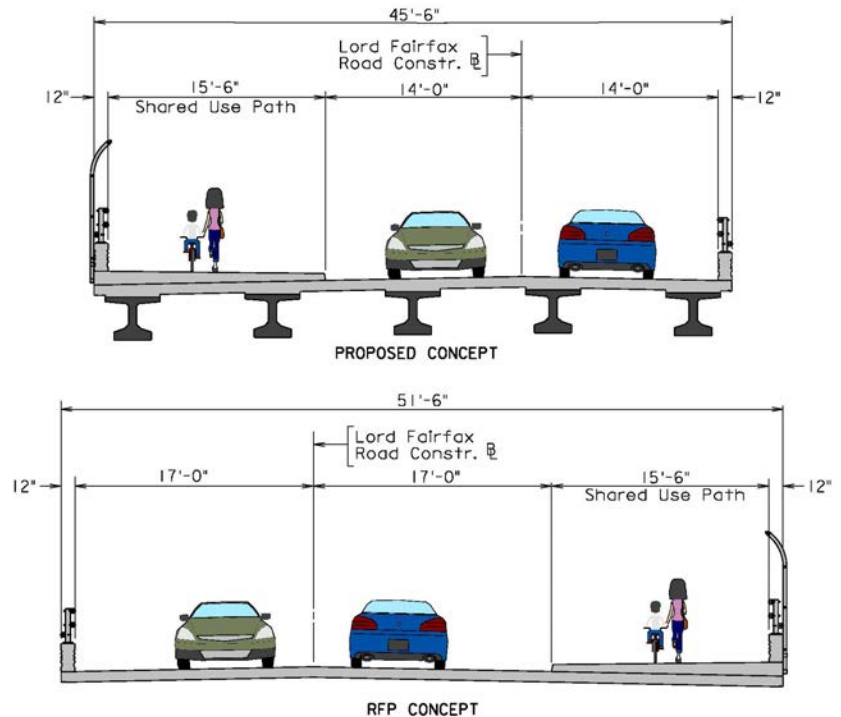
Typical Transverse Section (Looking West)
